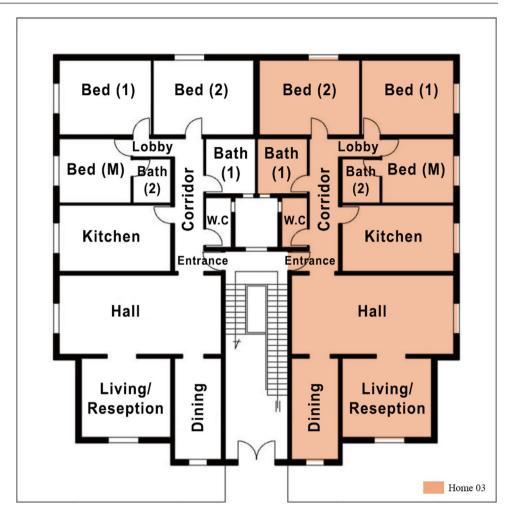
Ottoman Waqf building typical floor plan, represent homes 1, 2, and 4 Source (Kandakji 2013)
